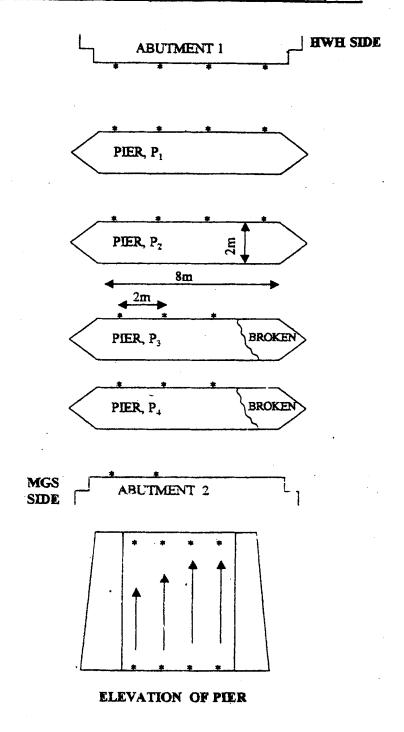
DETAILS OF SUB-STRUCTURE OF BRIDGE No.445 MGS-GAYA SECTION
